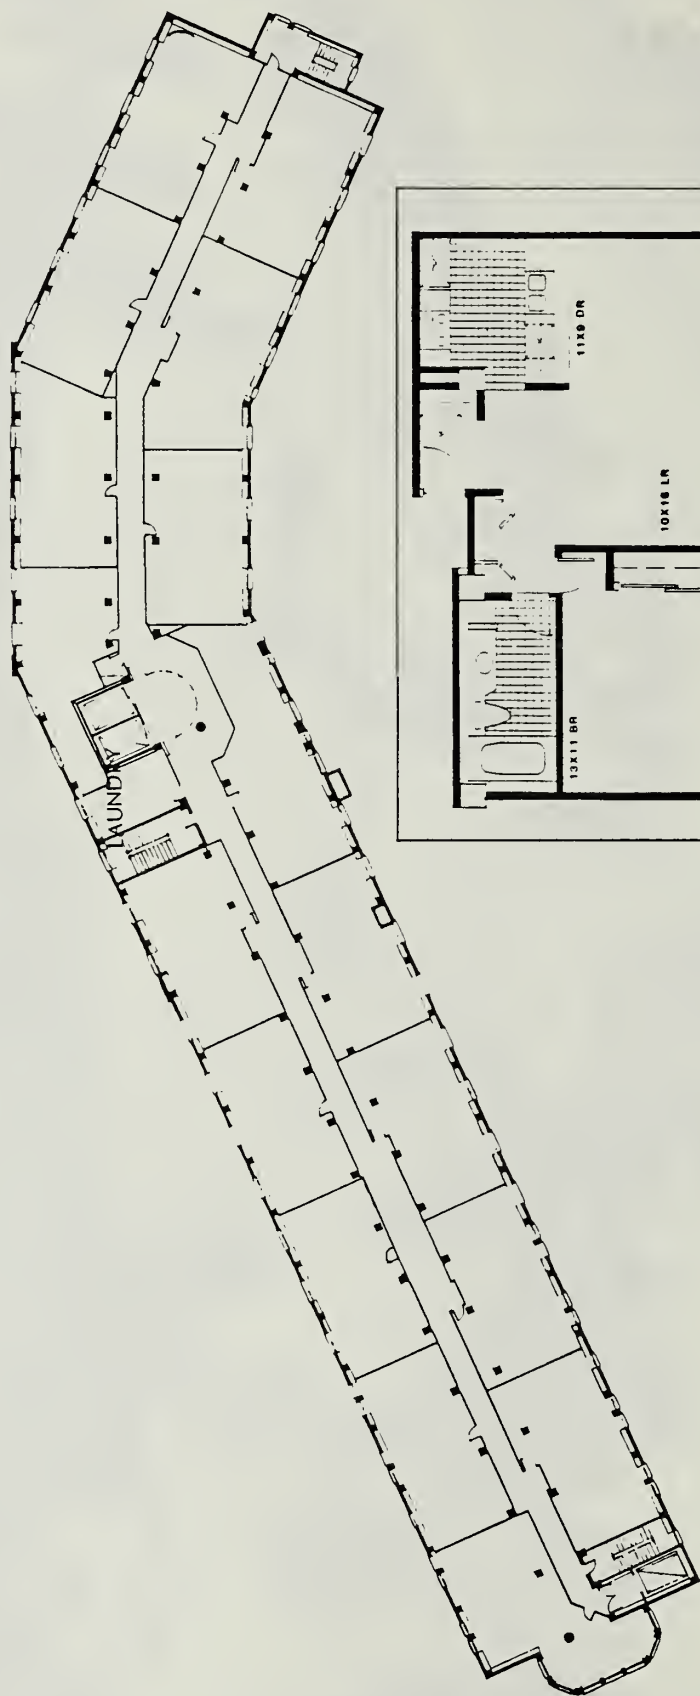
Hospital Buildings Floor Plan (Entry Level)
